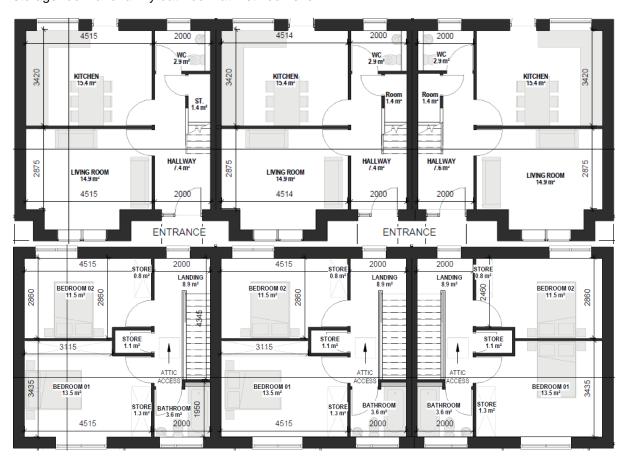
Typical ground floor plan of House Types 6.7-6.9 (top) and typical first floor plan of House Types 6.7-6.9 (bottom).
